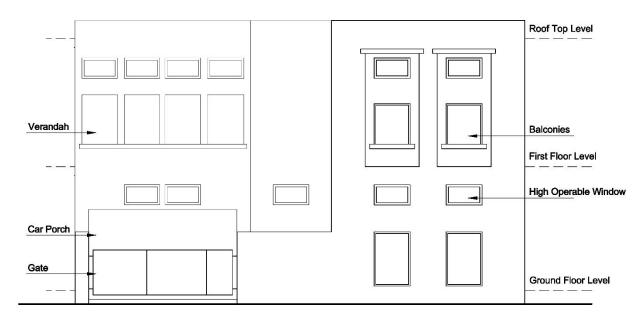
North Elevation of Proposed Courtyard House (Option A)
